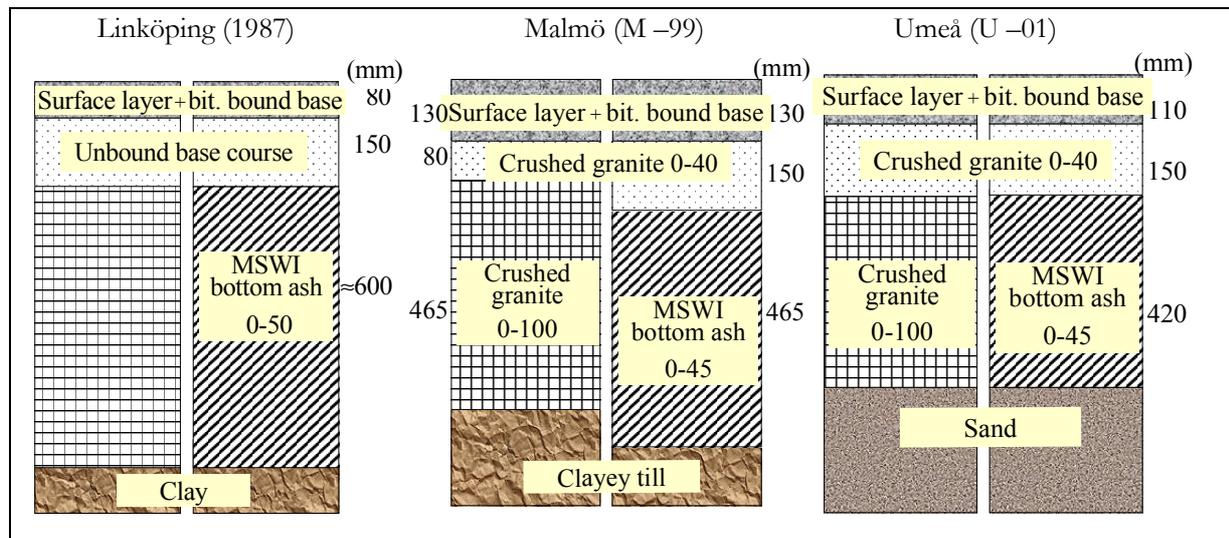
Test sections and reference sections in Linköping, Malmö and Umeå.
